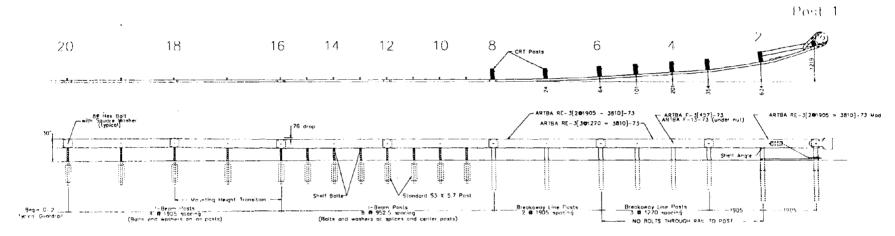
Details of the modified mini-MELT for the weak-post G2 guardrail system used for tests 471470-24 and 471470-25.
